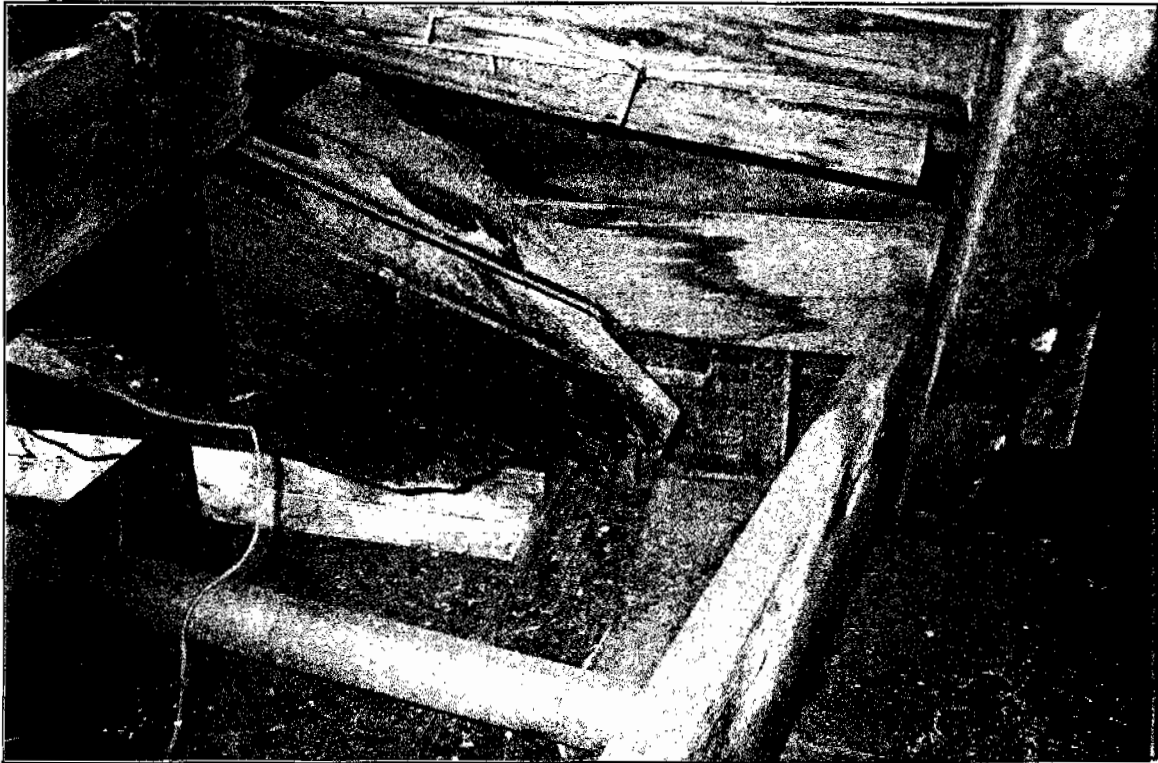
Odd detail at the base of the wainscot may indicate that the foundation post-dates the concrete slab floor of the carriage house.
